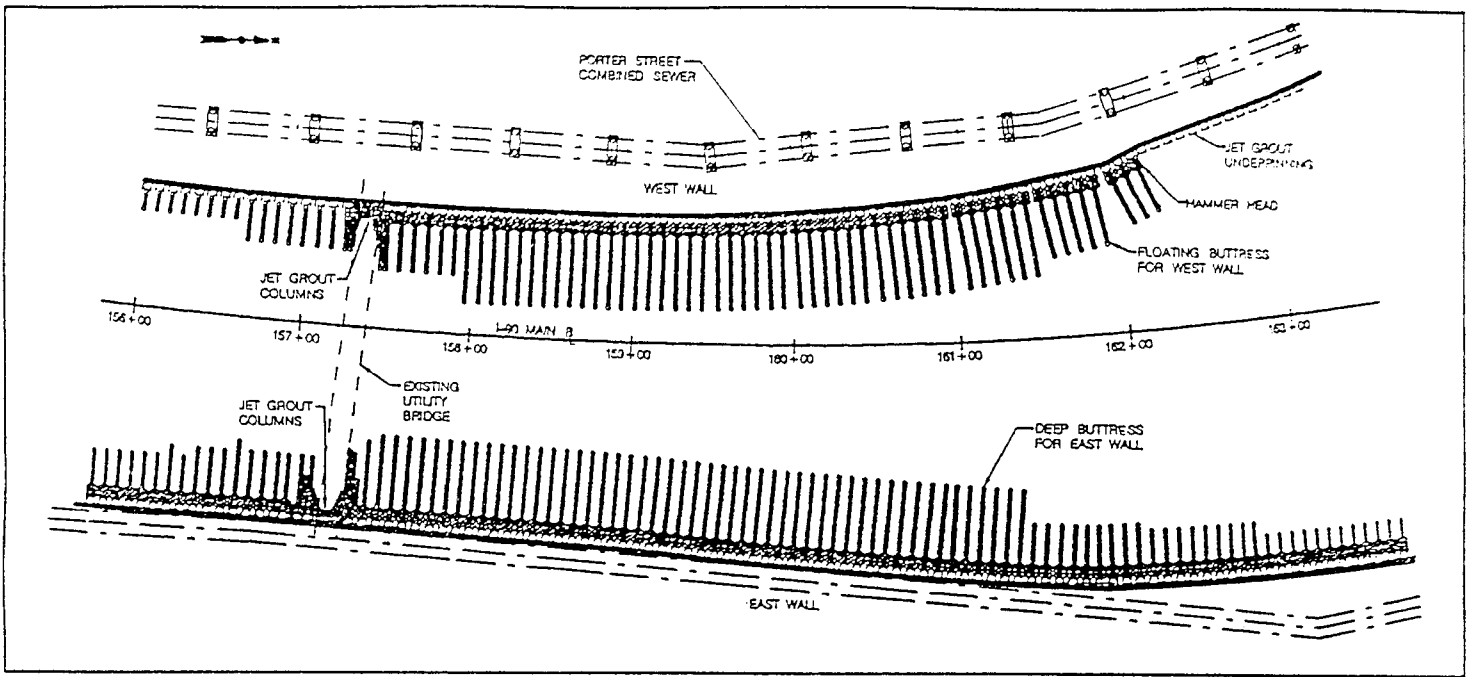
Location of remedial SMW buttresses and associated jet grouting in Zone C. (Stations in feet: 1 foot = 0.3048 m). (Nicholson and Chu, 1994).
